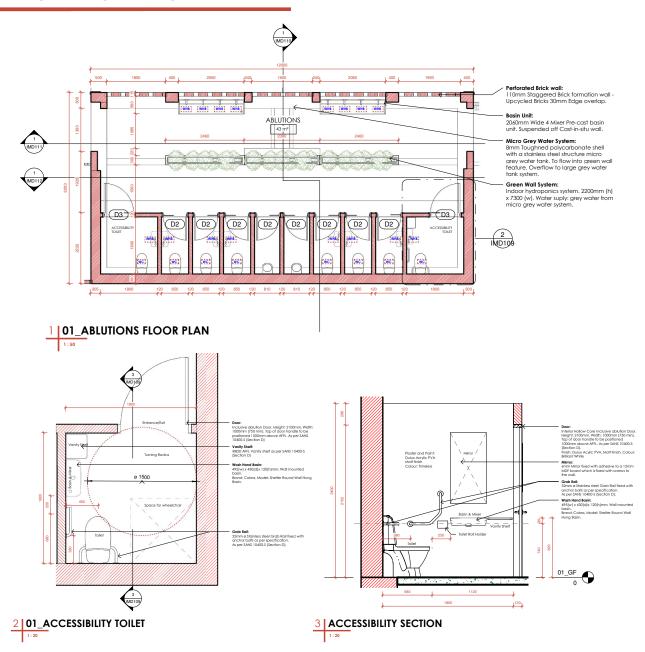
Ablution detail: Floor plans, accessibility toilet, (Author, 2021)
